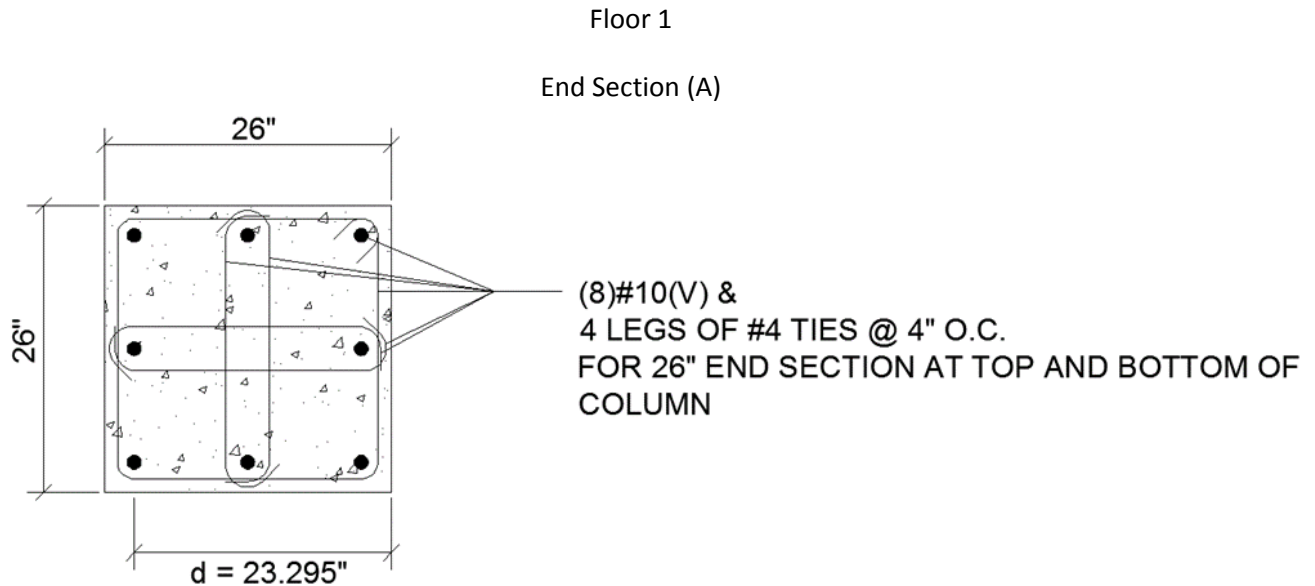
Exterior column, cross-section at end of column at ground floor level based on tsunami design requirements.
